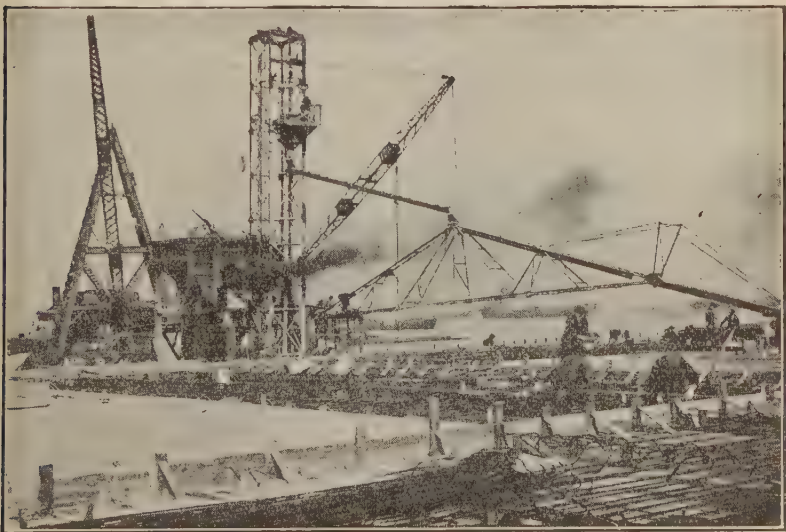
,957.—Floating Ransome steel tower counterweight chuting plant. Municipal piers, Stapleton, S. I.
